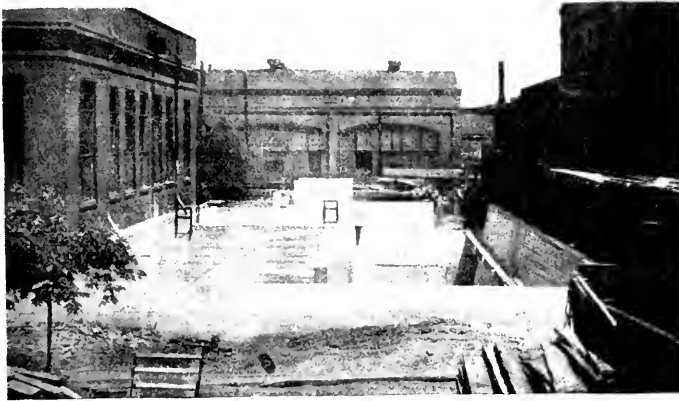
FILTER PLANT CONSTRUCTION, CENTRAL OF GEORGIA RAILWAY
